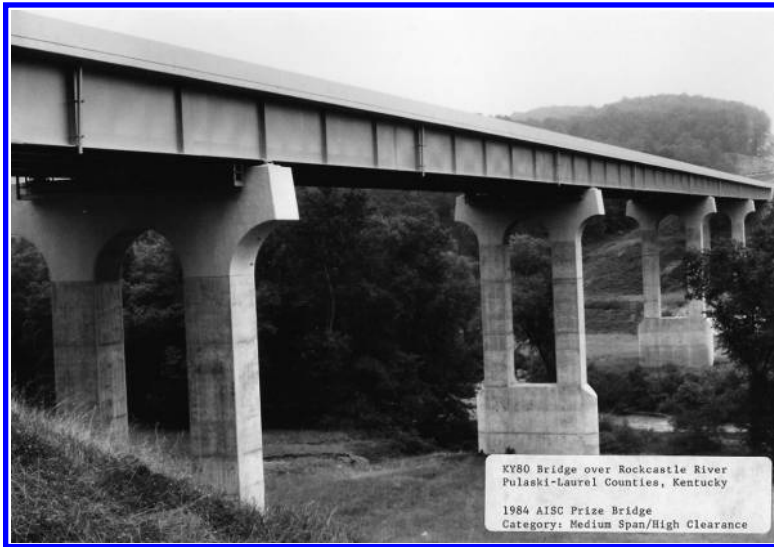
A typical plate girder bridge. (Courtesy of AISC, Chicago, IL.)
